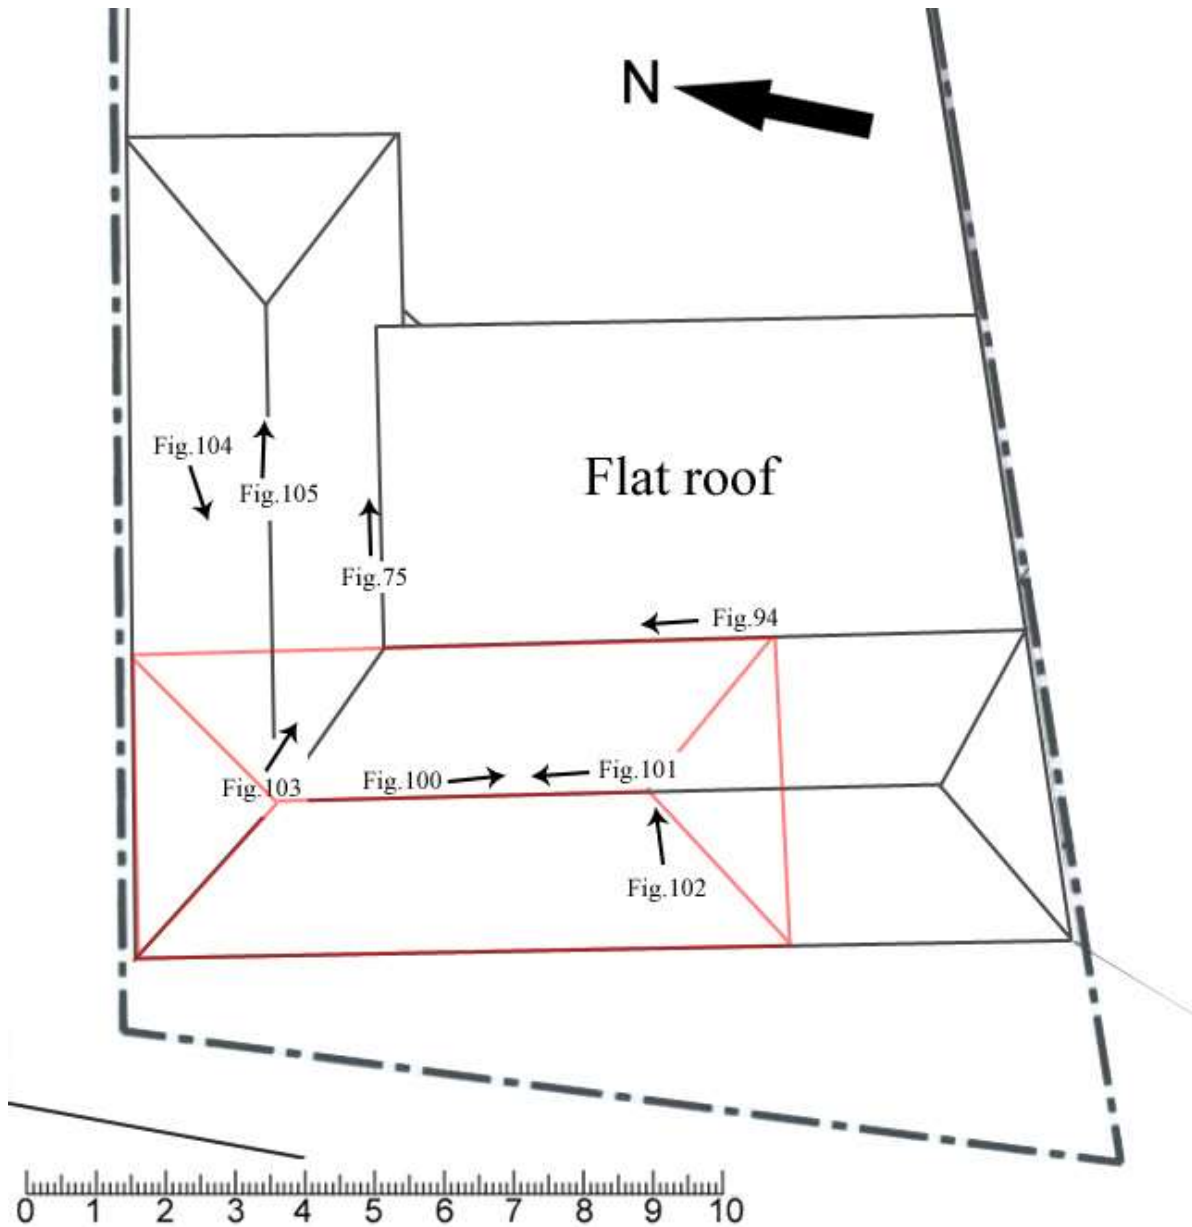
Plan showing direction of view of roof space pictures and original roofline, (red)
